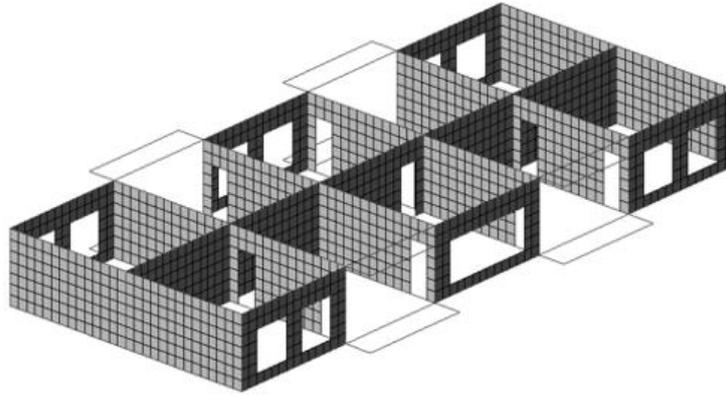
Location of masonry infill walls on a typical-floor of the studied monolithic frame building
